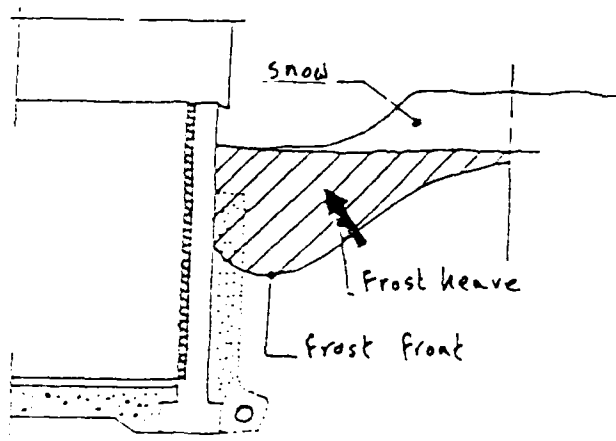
With a snow-free zone along the wall, the frost heave can be inclined towards the wall
